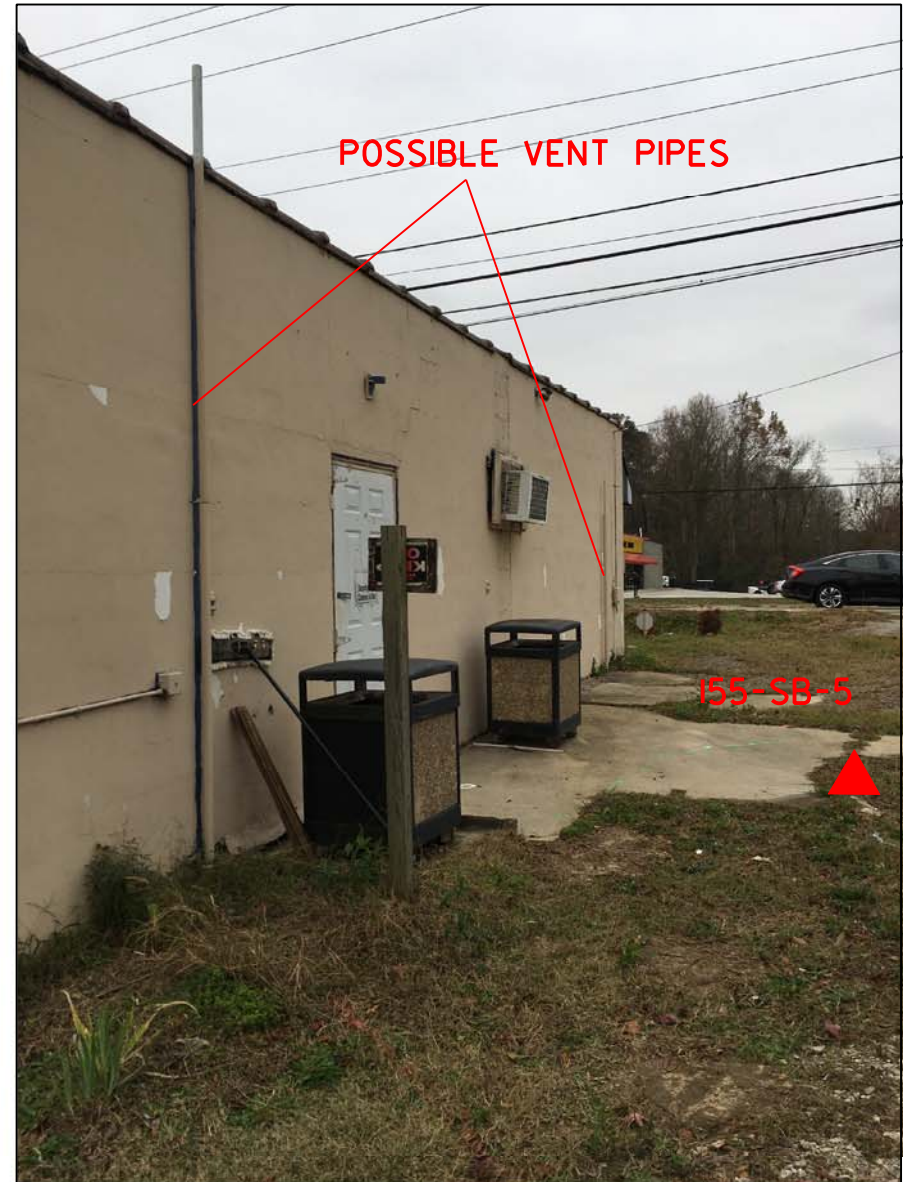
VIEW OF SOIL BORING LOOKING SOUTH
